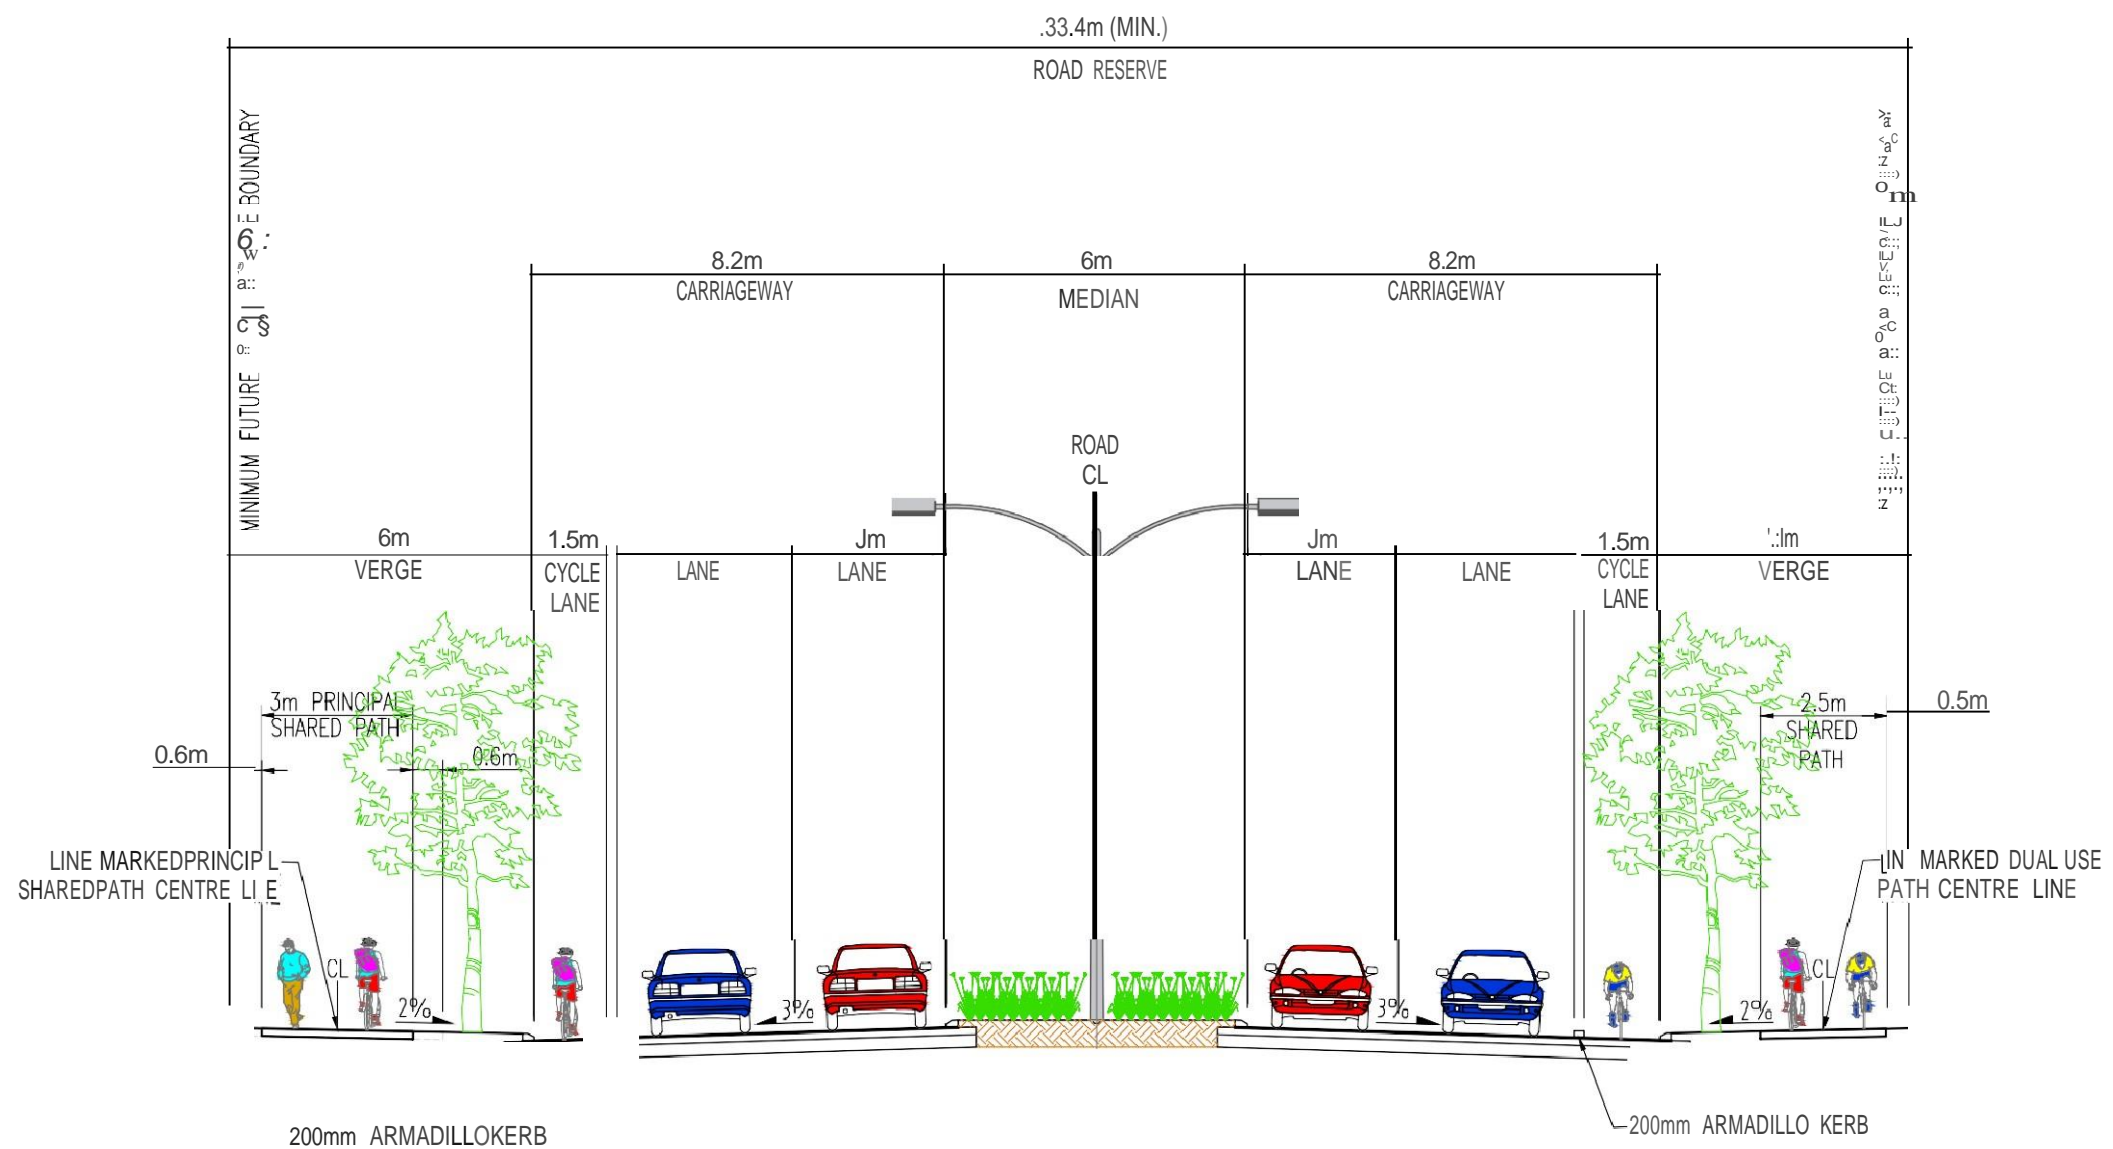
CROSS SECTION 13AD CJERUP ROAD
